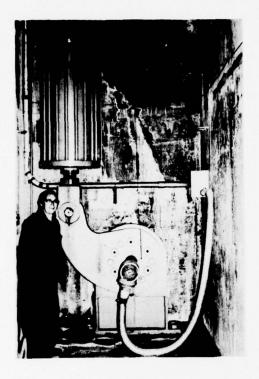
Spillway bascule gate actuating cylinder on left abutment
